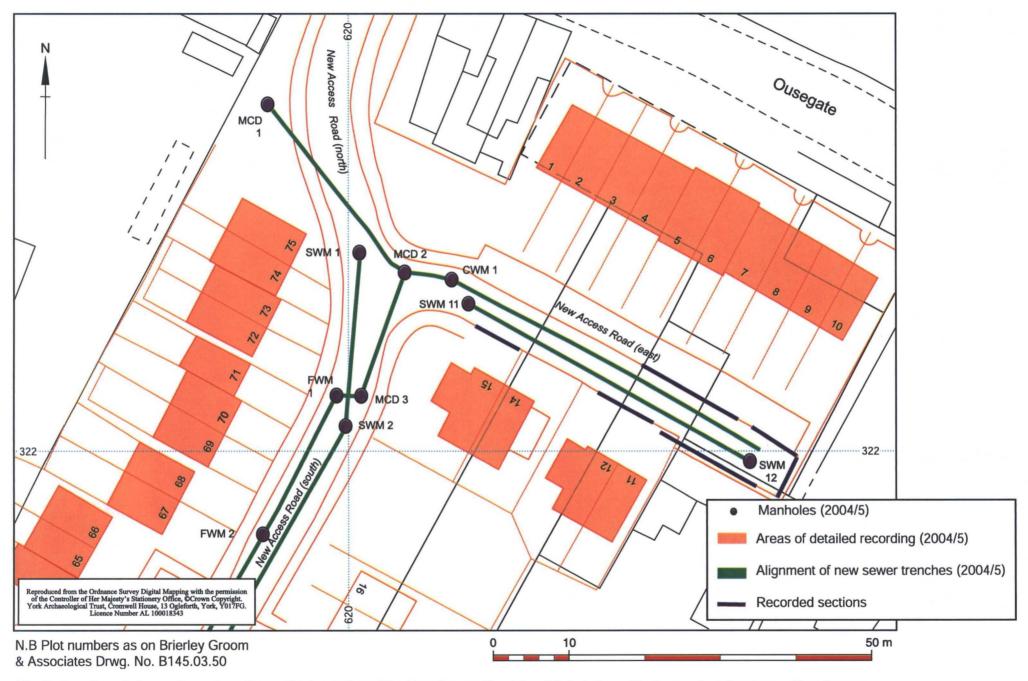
Location of observations along the northerly section of the New Access Road (south) ;together with observed works along New Access Roads north and south
